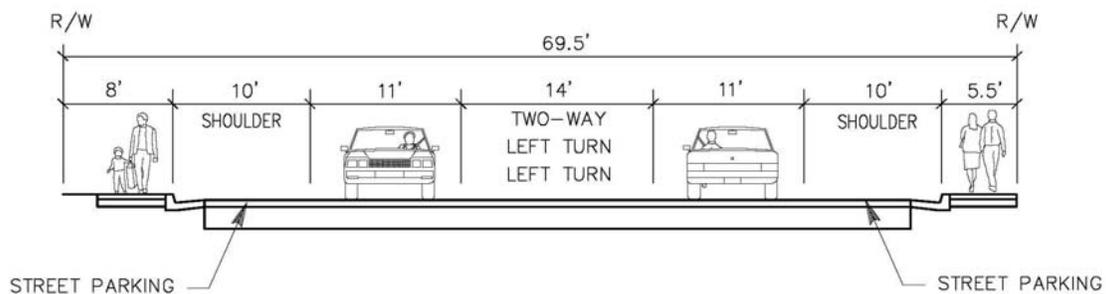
Segment 1 – Interim Roadway Section with Street Parking (Looking East)
